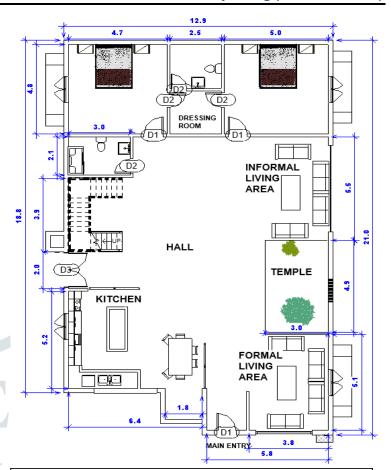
Ground Floor plan layout (Level 1) measurements are in metre
